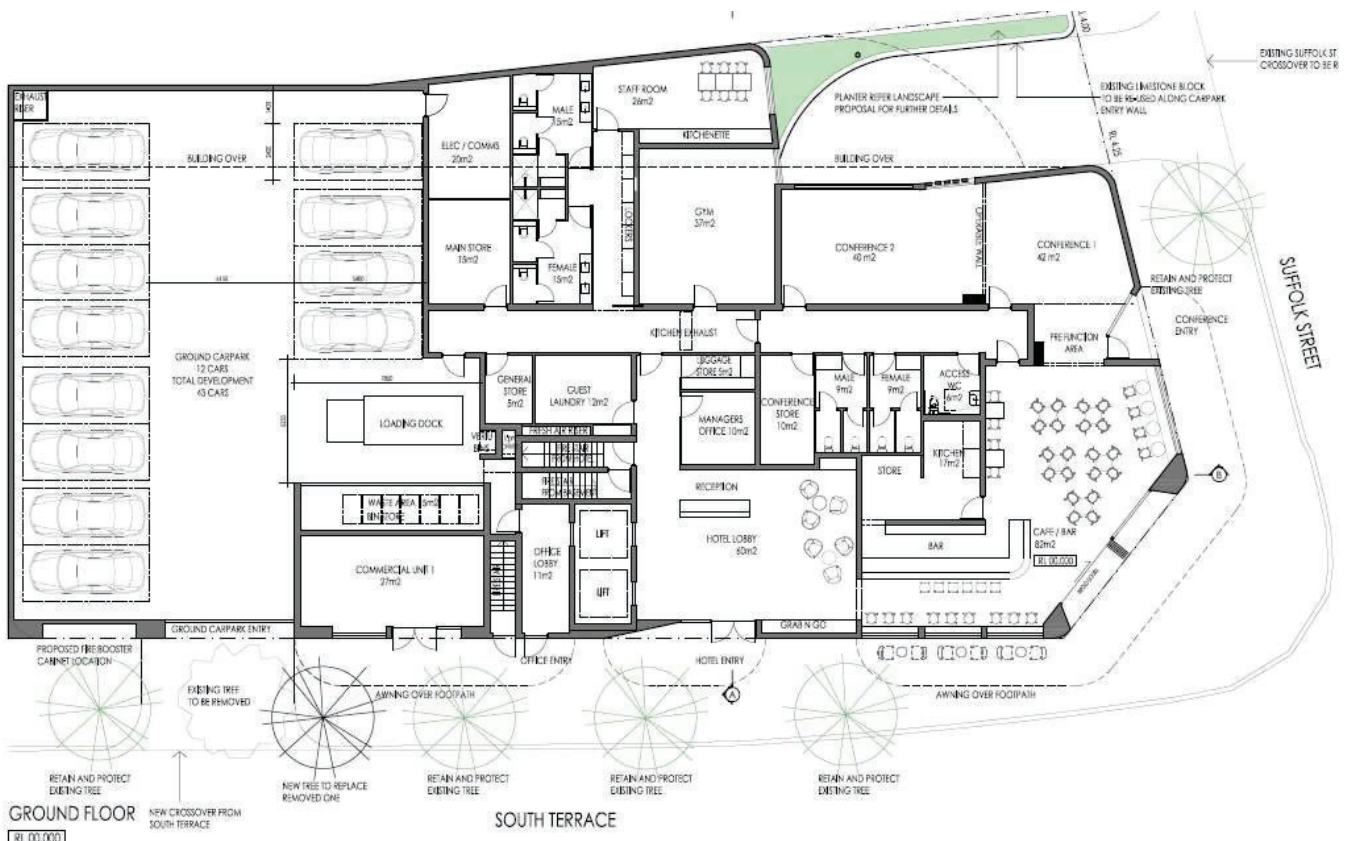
Proposed ground floor level parking (source: Harris-Jenkins Architects)
